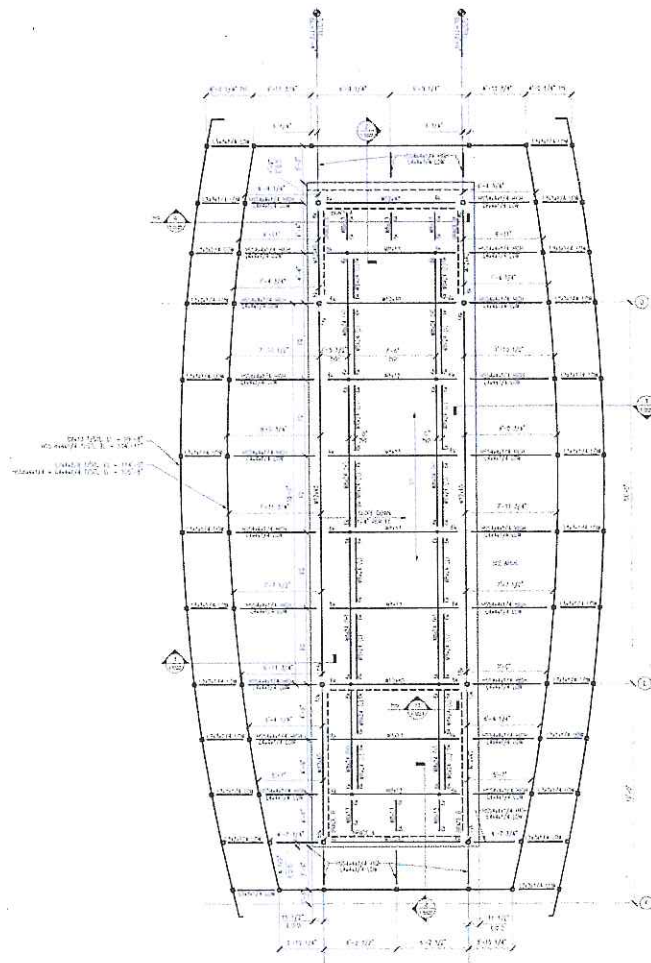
Lantern Framing Plan, larger plan found in Appendix A
